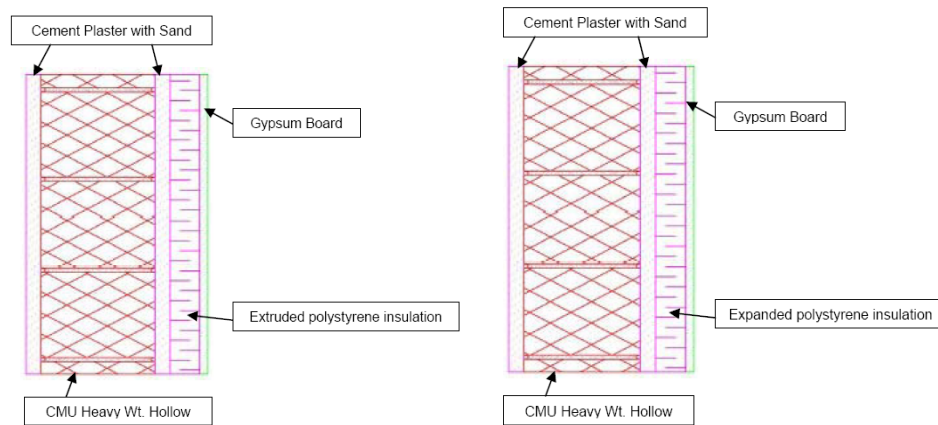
Cross section of (a) Ext.P and (b) Exp.P wall system
